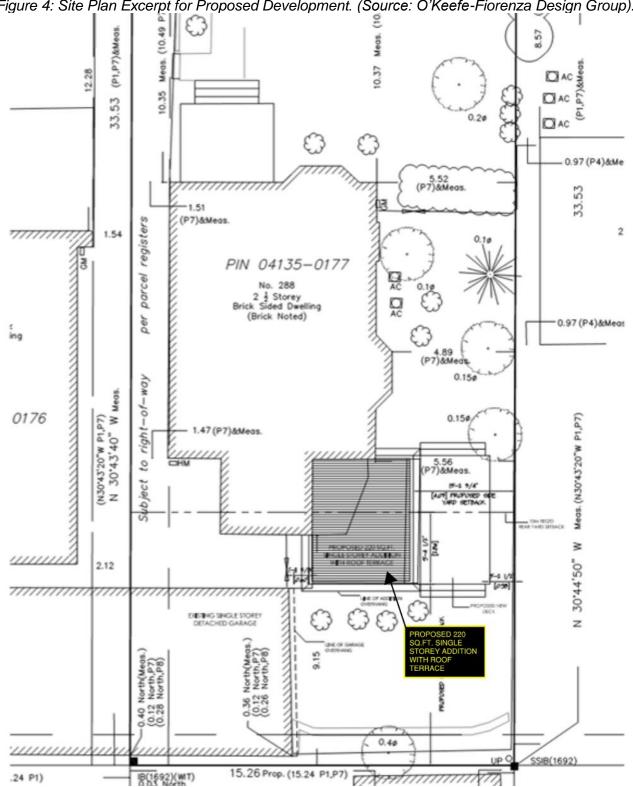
Site Plan Excerpt for Proposed Development. (Source: O'Keefe-Fiorenza Design Group).
